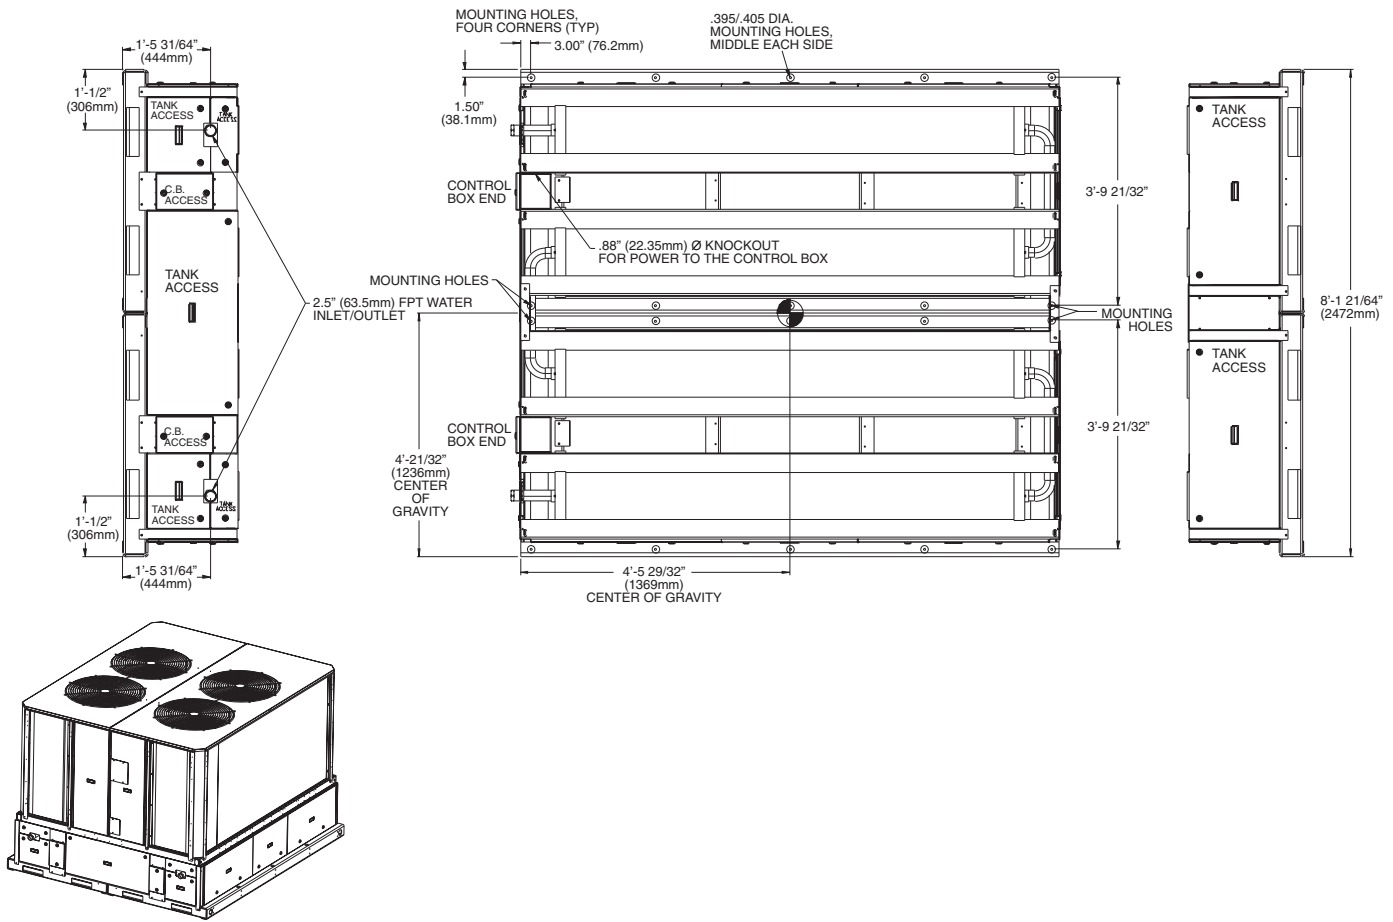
Dimensions 30RA-900--010 (Unit Sizes 032-055)
